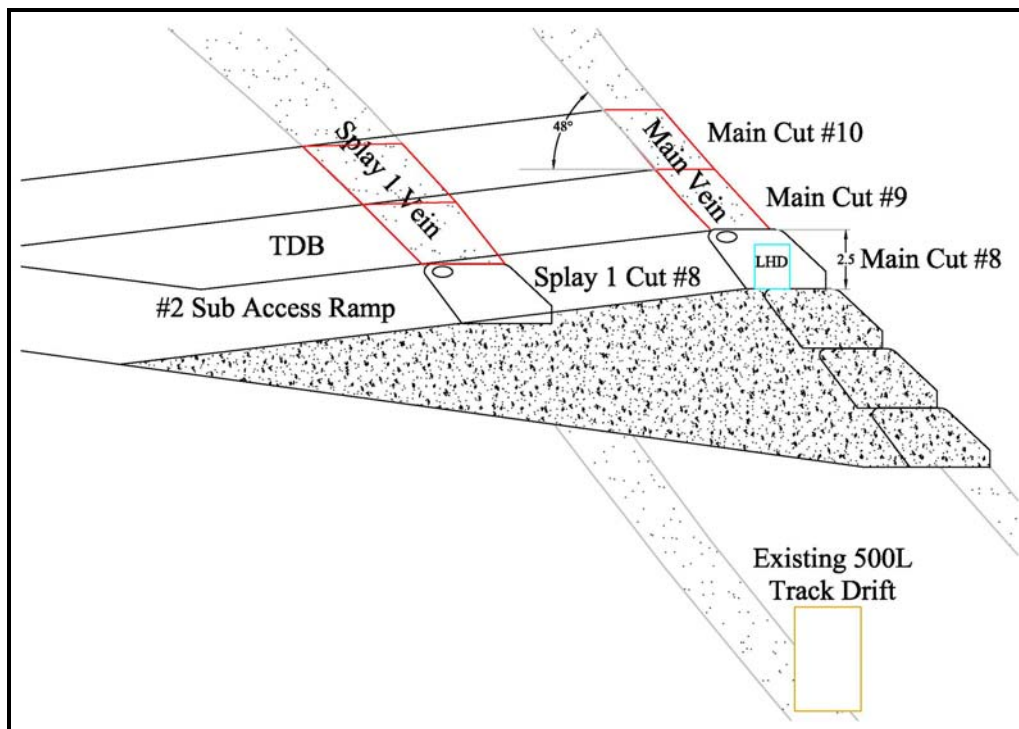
Schematic Section - Typical Cut and Fill Stopes, Lucky Queen (SRK, 2013)
